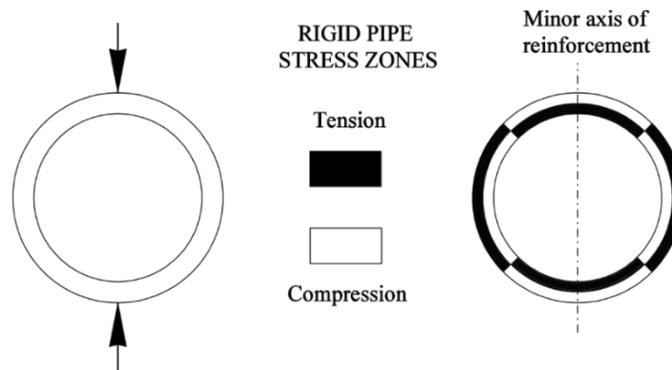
Zones of Tension and Compression in Rigid Pipes
